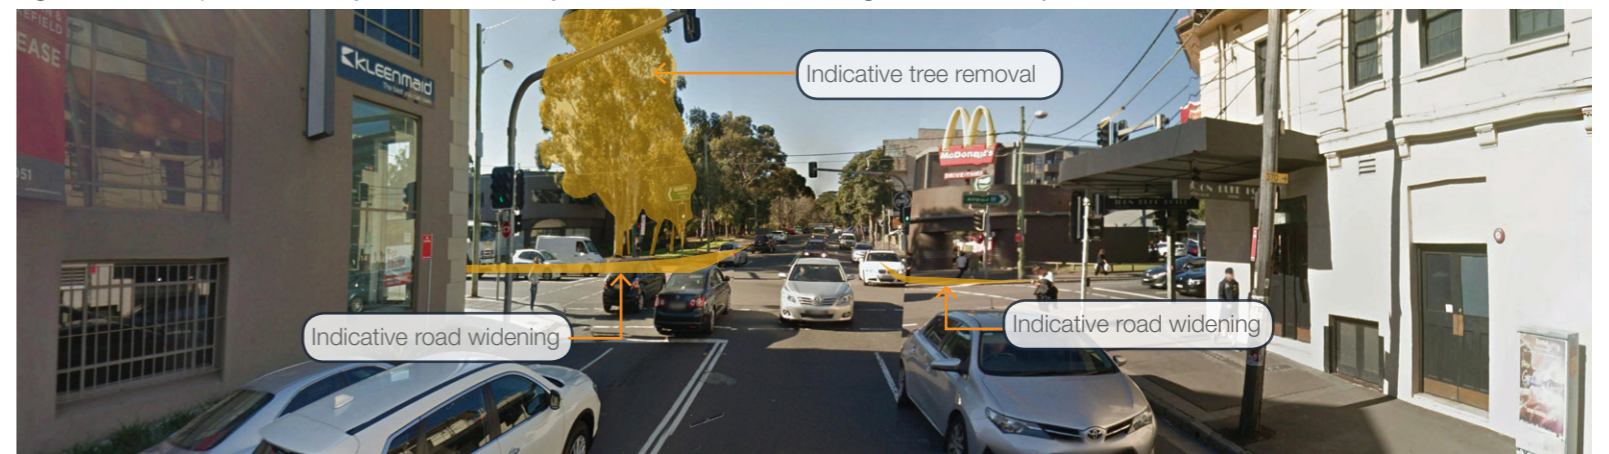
Viewpoint06: Botany Road and McEvoy Street intersection, looking east into McEvoy Street
